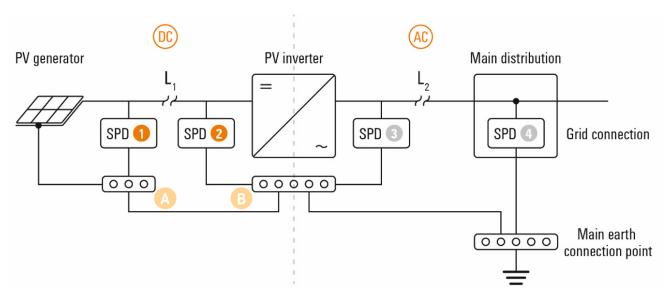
Source: EN 51643-32:2020 - Installation of SPDs in a building without external lightning protection
